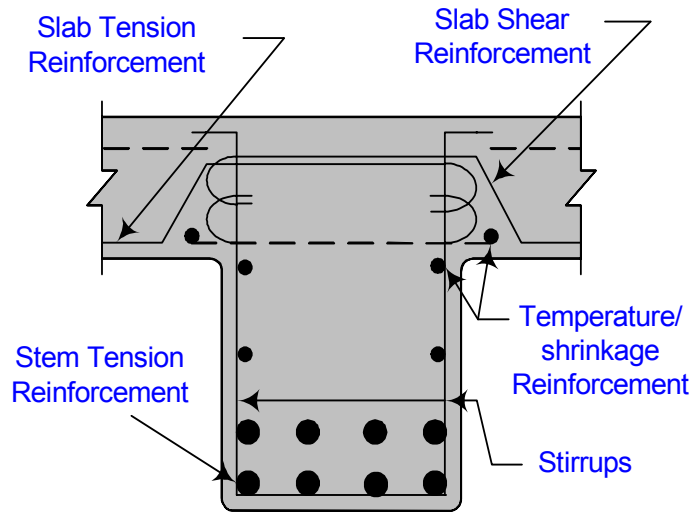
Steel Reinforcement in a Concrete Tee Beam
